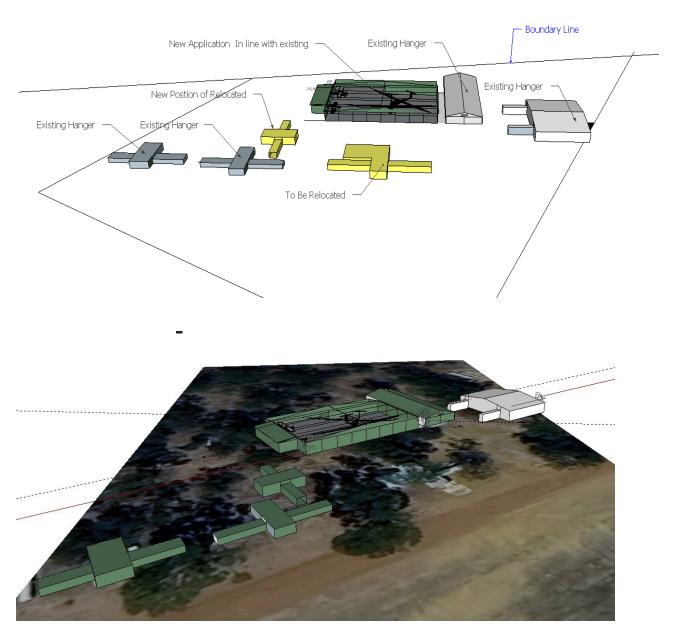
Final layout with new proposed widespan hanger next to existing hanger
